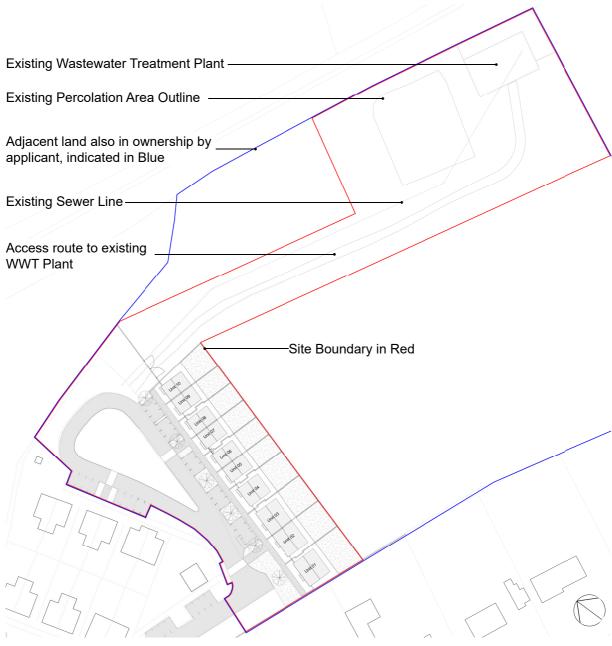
Location of wastewater treatment plant and access track (not to scale)
